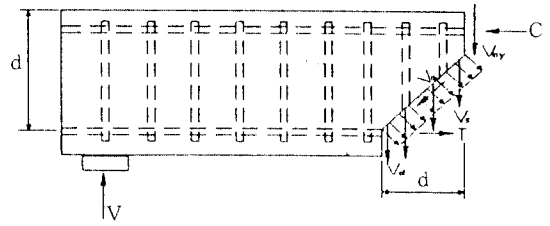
Forces at diagonal crack in fibrous concrete beam
